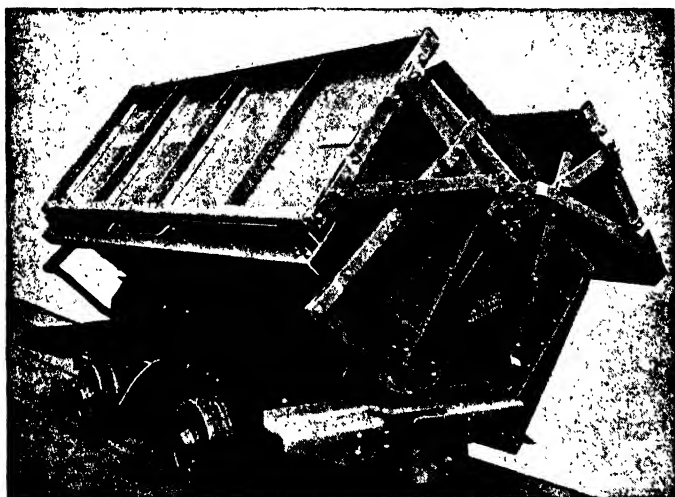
Western 6-yd. side-dump car, 36-in. gage, used at Fort Peck tunnels, later shipped to Allegheny Tunnel, Pennsylvania Turnpike. Roller-bearing wheels are 16 in. in diameter; wheelbase is 50 in.; weight, when empty, 7,600 lb. Wooden sideboards, 12 in. high, were added to increase capacity to $7\frac{1}{2}$ cu. yd.
